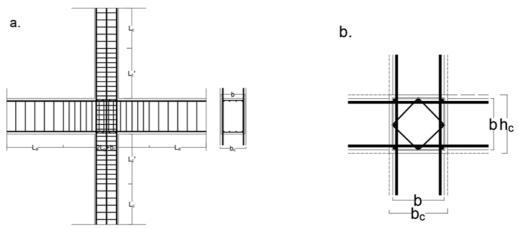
a. Outline of beam column connection armature, b. the detail of the connection of the column beam joint
